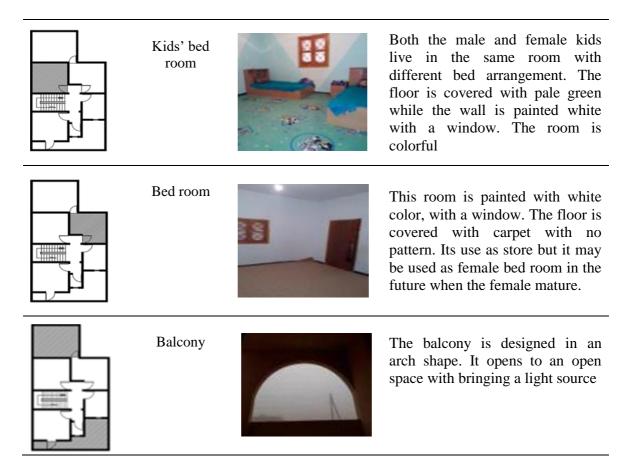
First floor layout of contemporary Ghadames house (Institute of Ghadames urban development, 2018)
